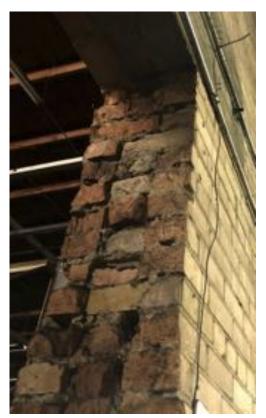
Unreinforced masonry wall in the EDSCO portion of the building.
